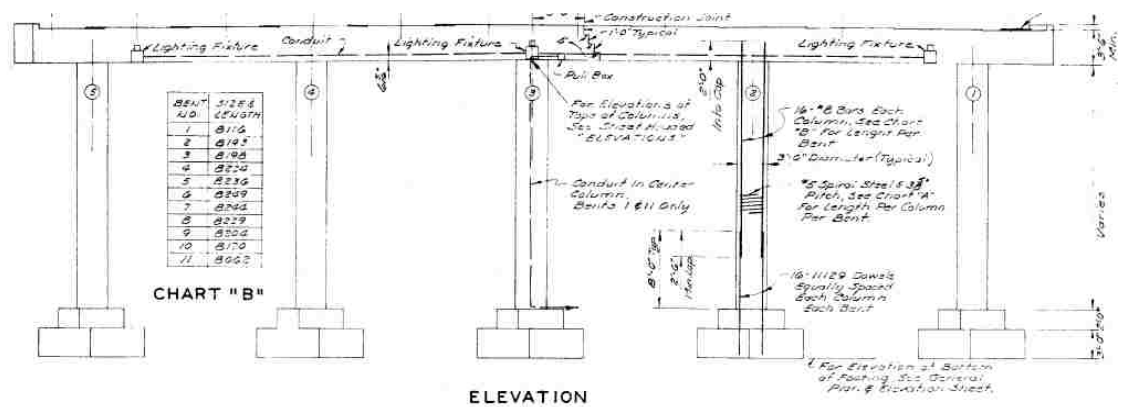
Bridge G-1064 - Elevation of a typical bent
